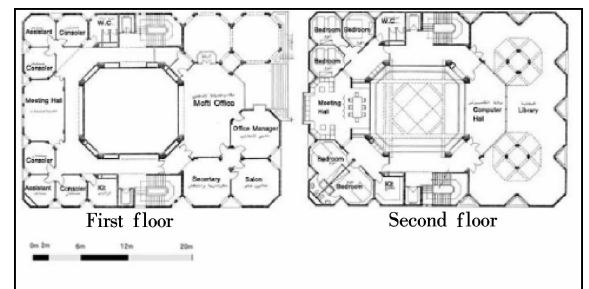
Design elements of the El Eftaa building on the first and second floors
